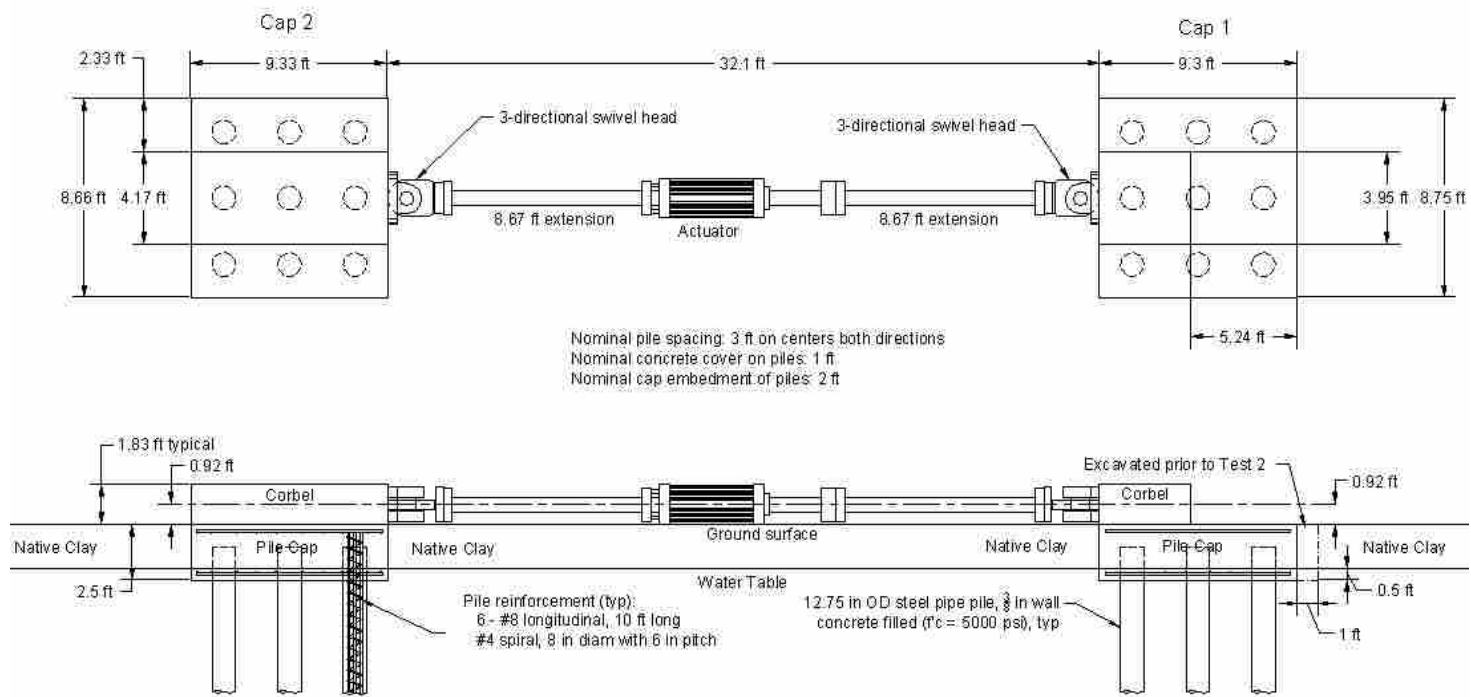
Plan and profile drawings of pile caps 1 and 2 during Test 1 when the pile groups were pulled together by the actuator. During Test 2 the soil adjacent to the pile cap was excavated to the base of the cap and the pile caps were pushed apart by the actuator.
